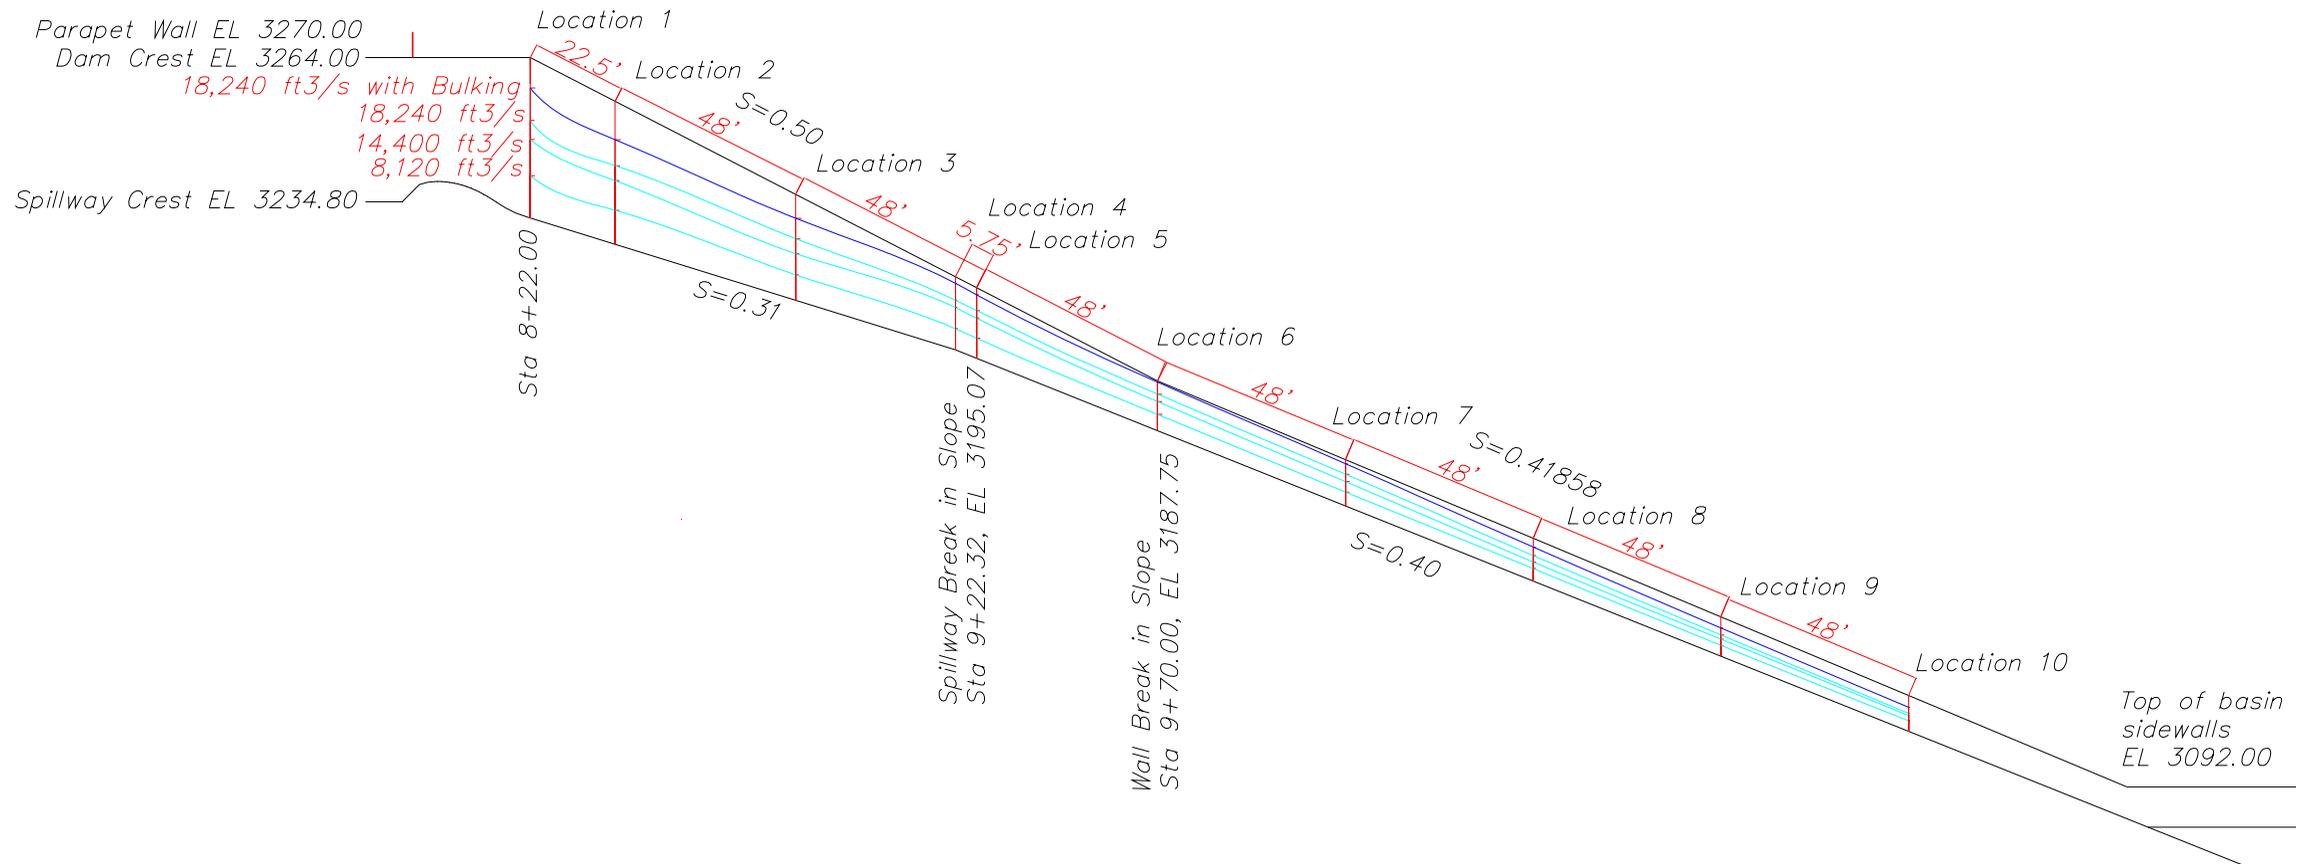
Water surface profiles in the spillway chute for combined spillway and outlet works flows. Estimated bulking was added in for the discharge relating to the top of parapet wall condition at elevation 3270 ft.
